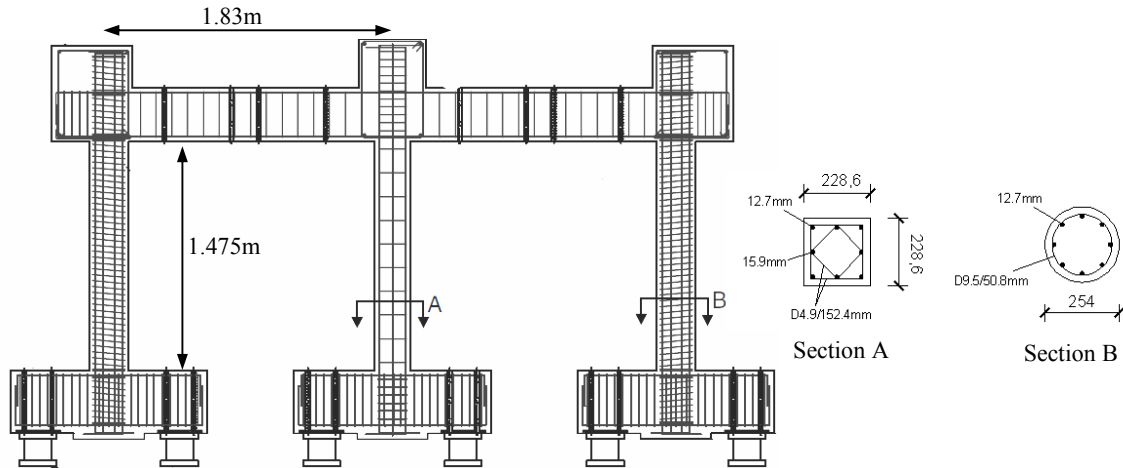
Elwood & Moehle (2008) frame reinforcement layout and cross-section detailing
